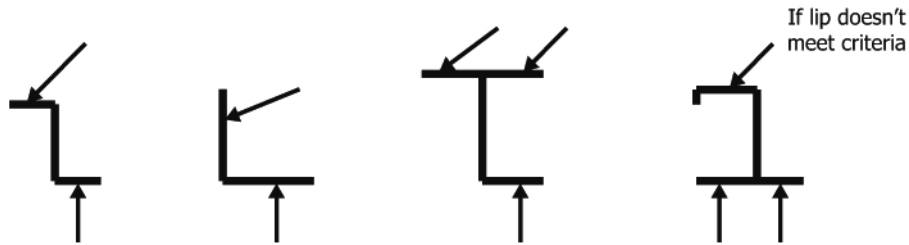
Example One-Edge-Free Elements in Structural Stiffener Shapes
